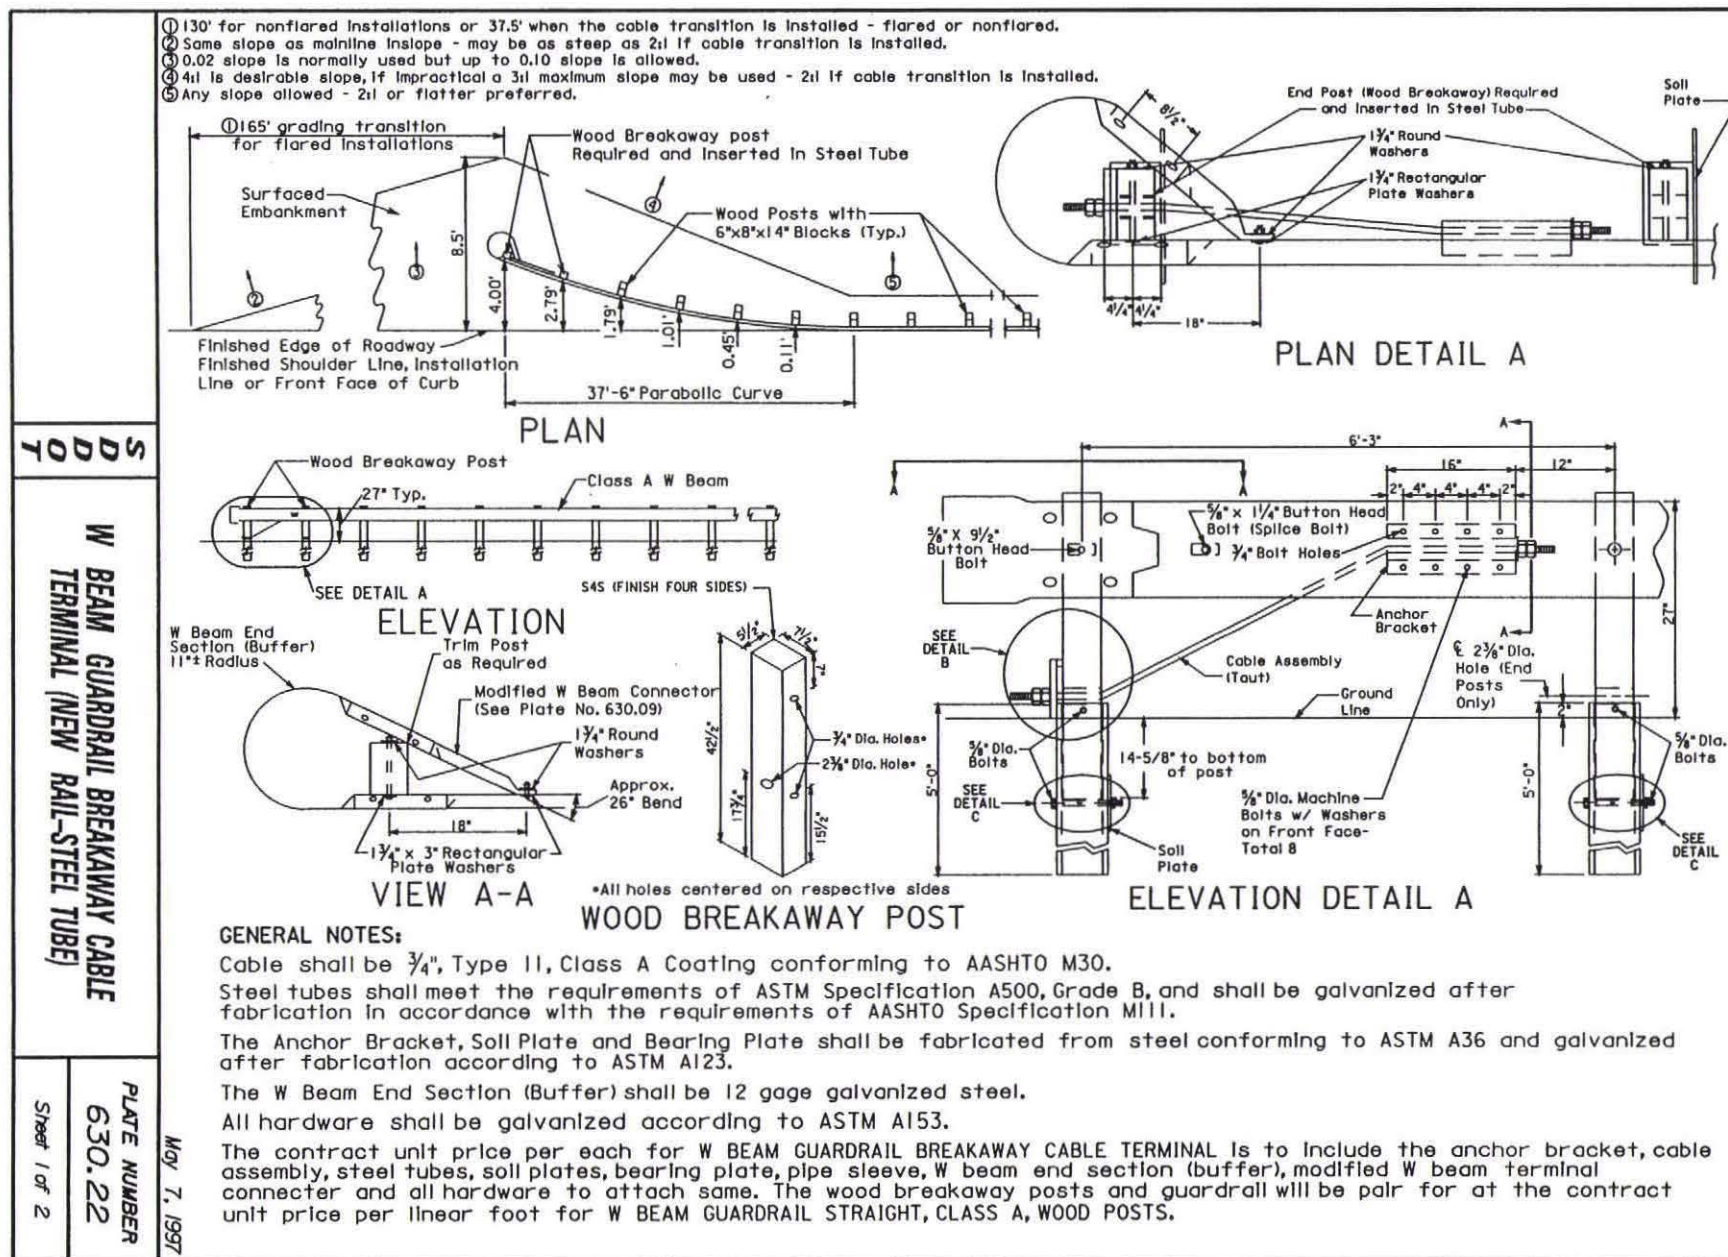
Cable Guardrail to W-Beam Transition Design Details (Continued)
